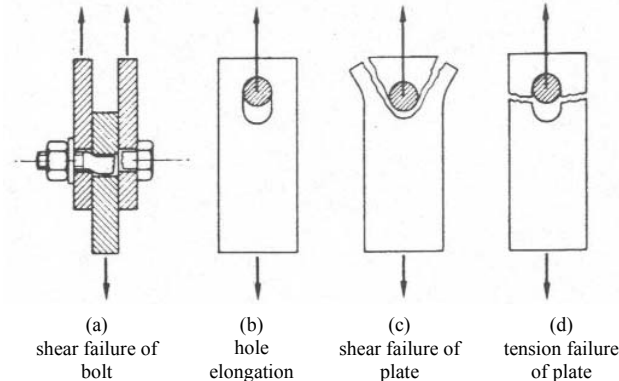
Possible failure mechanism of bolted joint loaded in shear [3].
